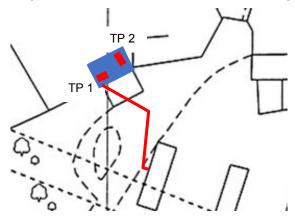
Indicative plan showing location of Test Pits 1 and 2 (red) within the stripped footprint of the new Bio-Mass building (blue tone). Red line shows route of service pipes.
